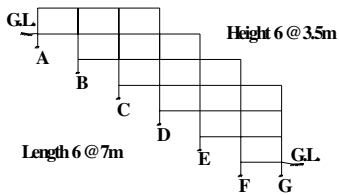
STEP BACK BUILDINGS ON SLOPING GROUND (4 TO 11 STOREY)
